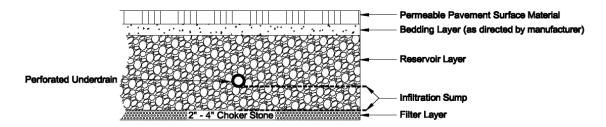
Cross section of an enhanced permeable pavement design with an underdrain.
